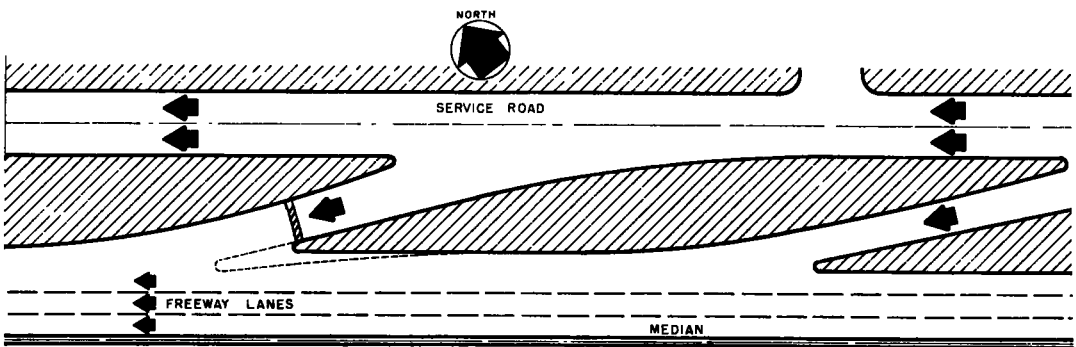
Ramp study section, Gulf Freeway, Houston—Study IV.
